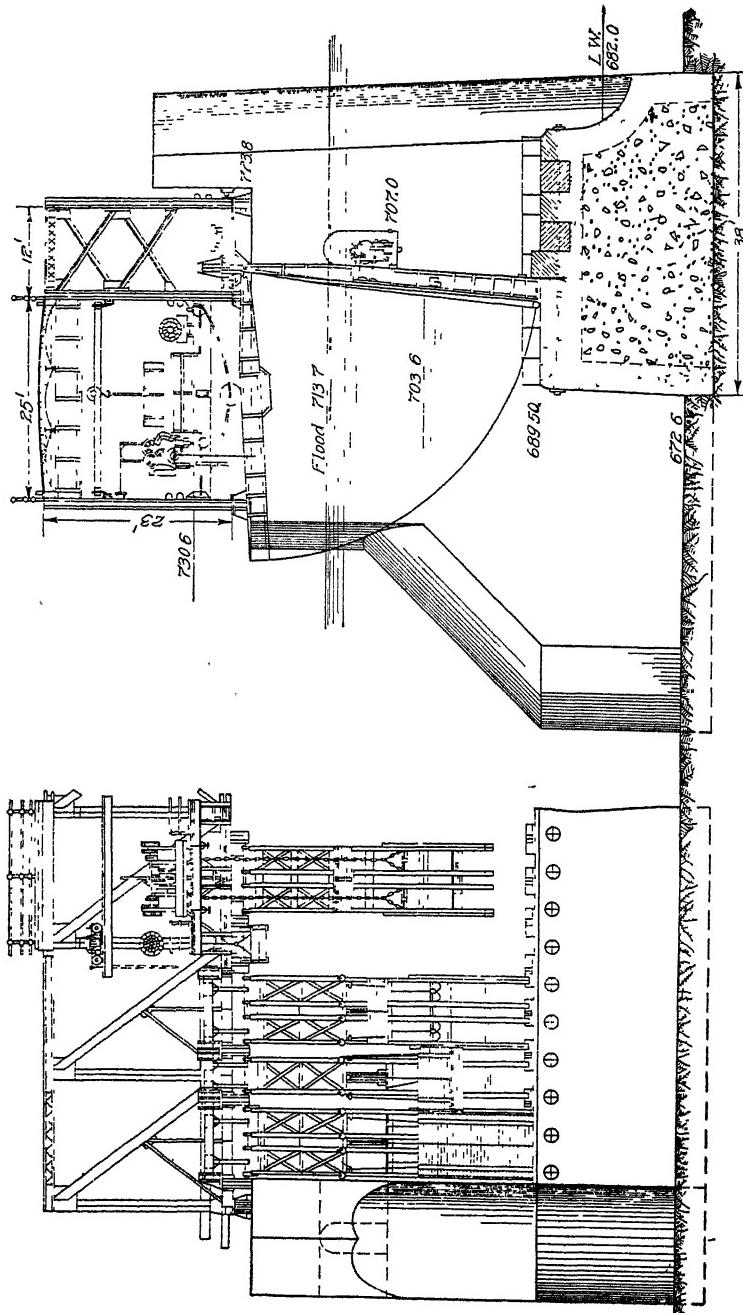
Elevations and Part Section of St. Andrew's Rapids Semi-Open Dam
